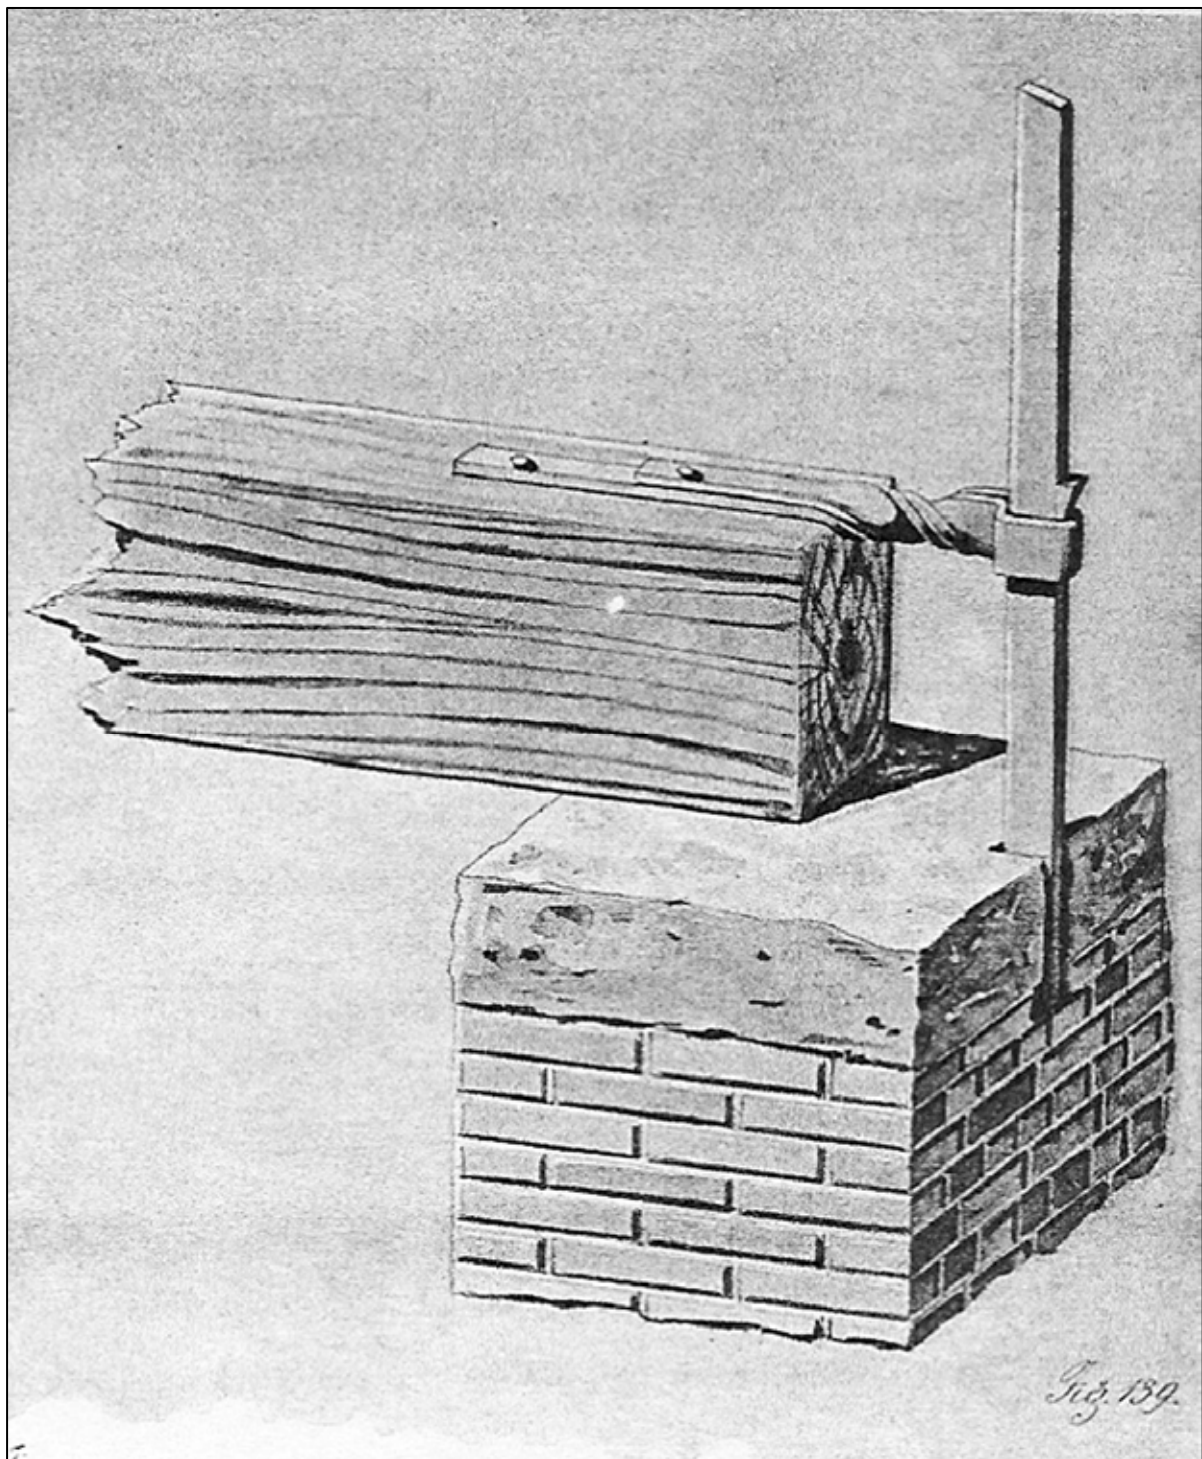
Anchor of wooden beam made up by iron bar fixed on beam. (C. Formenti, La pratica del fabbricare, Milano 1893, parte prima, pag.184)
